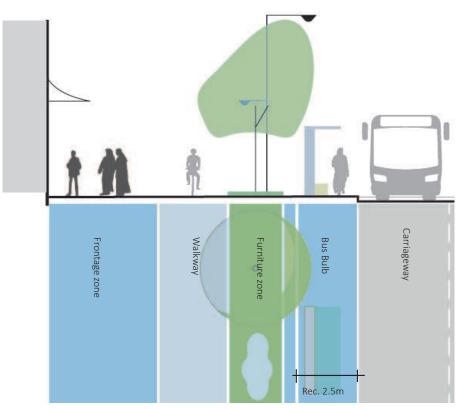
Plan and Section of recommended width of Bus bulb: 2.5m
